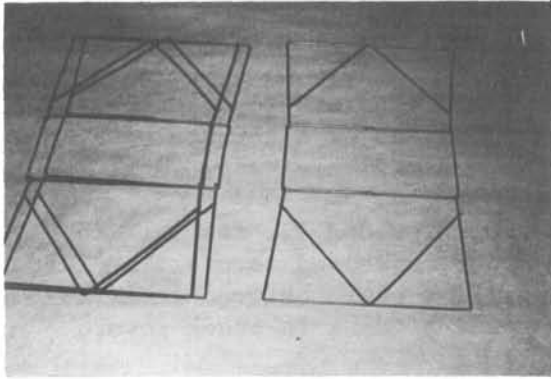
Welded rod hinged trapezoidal frames in flat position.
